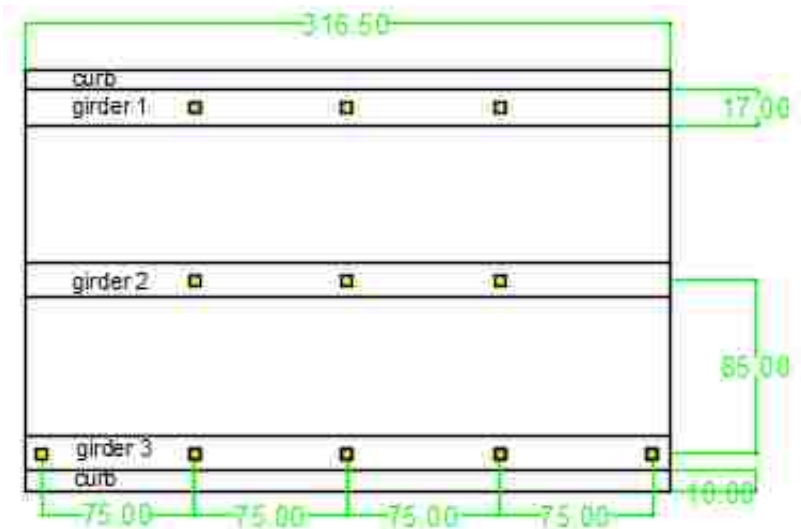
Span 4 Prism Layout (Dimensions shown in inches, 1 in. = 25.4 mm)
